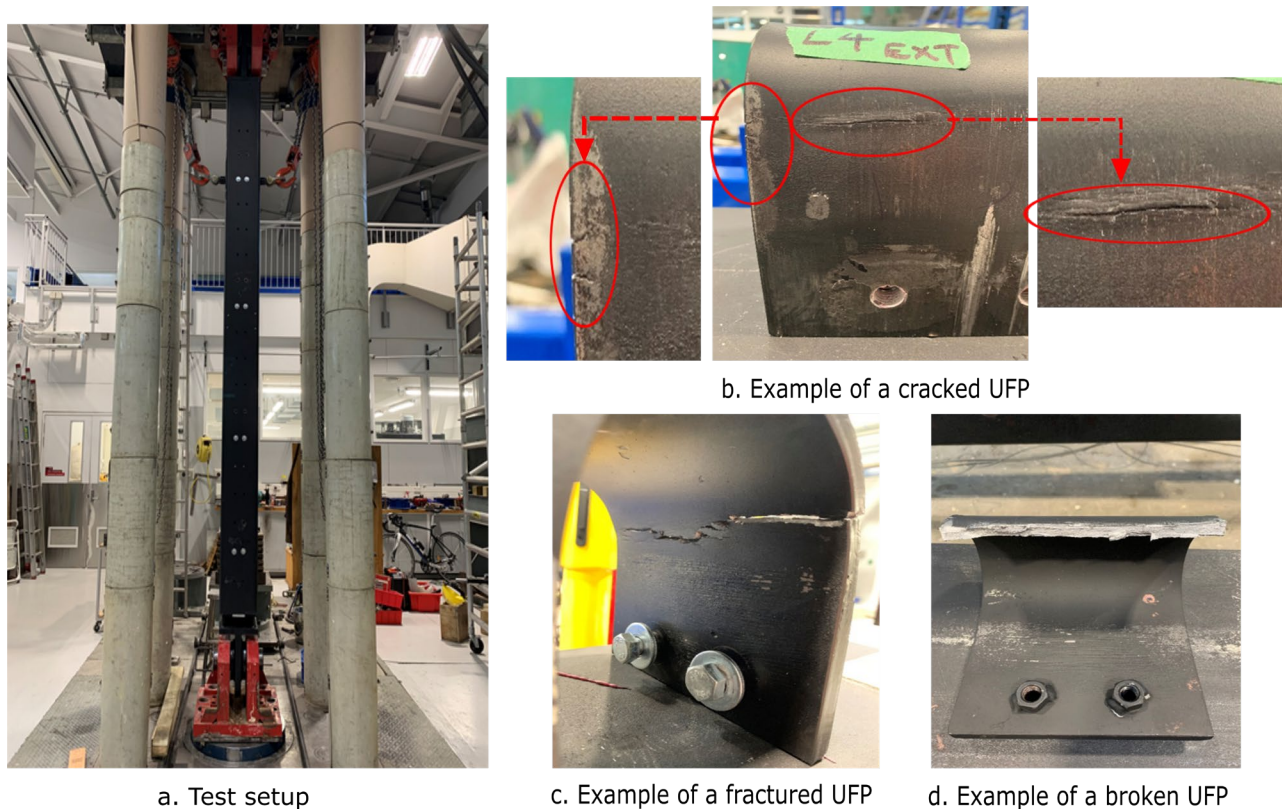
a) Test setup; b) Example of a cracked UFP; c) Example of a fractured UFP; d) Example of a broken UFP
